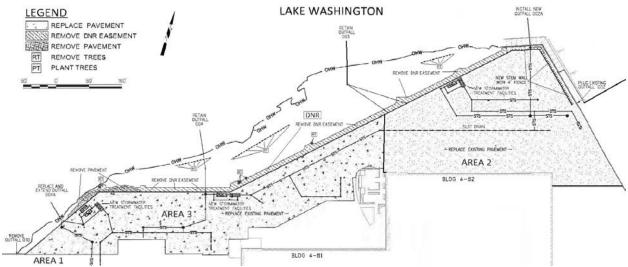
Plan drawing of East and Central Apron R (Areas 2 and 3) that shows the general construction plan (Adapted from Wood 2019a Figures 10, 12, and 13).
